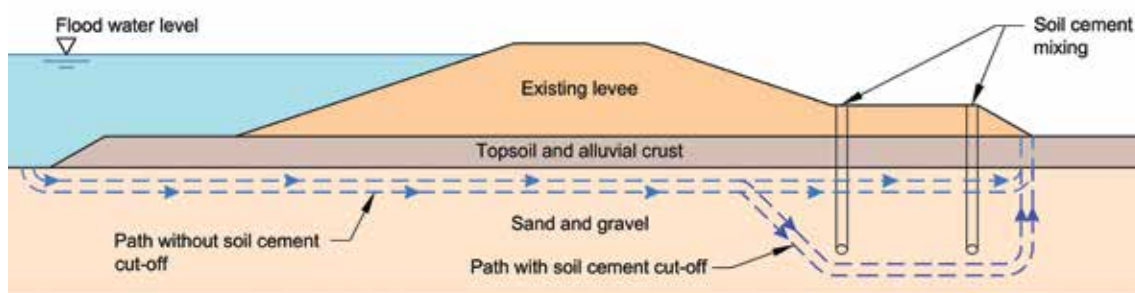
Deep soil mixing to control seepage (after de Kant and Wiggers, 2009, courtesy Royal HaskoningDHV)
